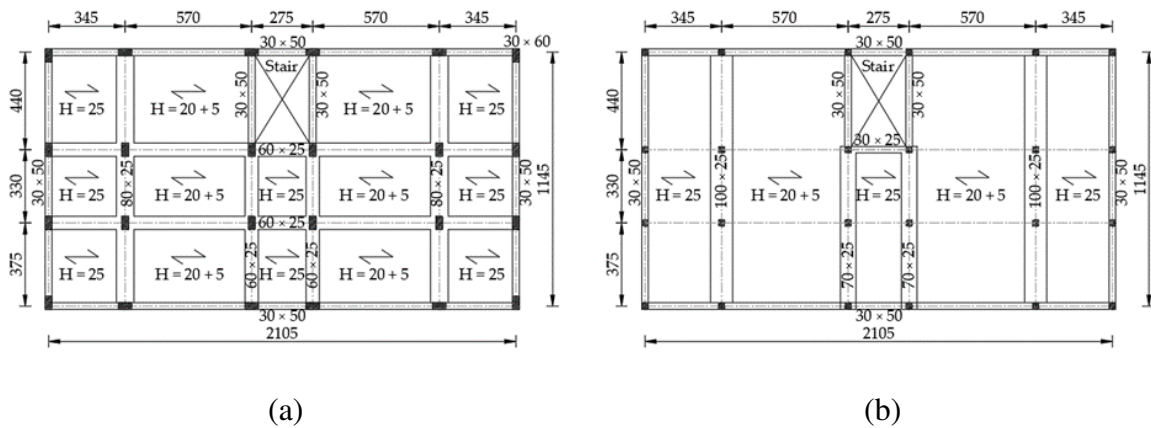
Existing buildings prototype plan views for a) Seismic Load Design and b) Gravity Load Design.
